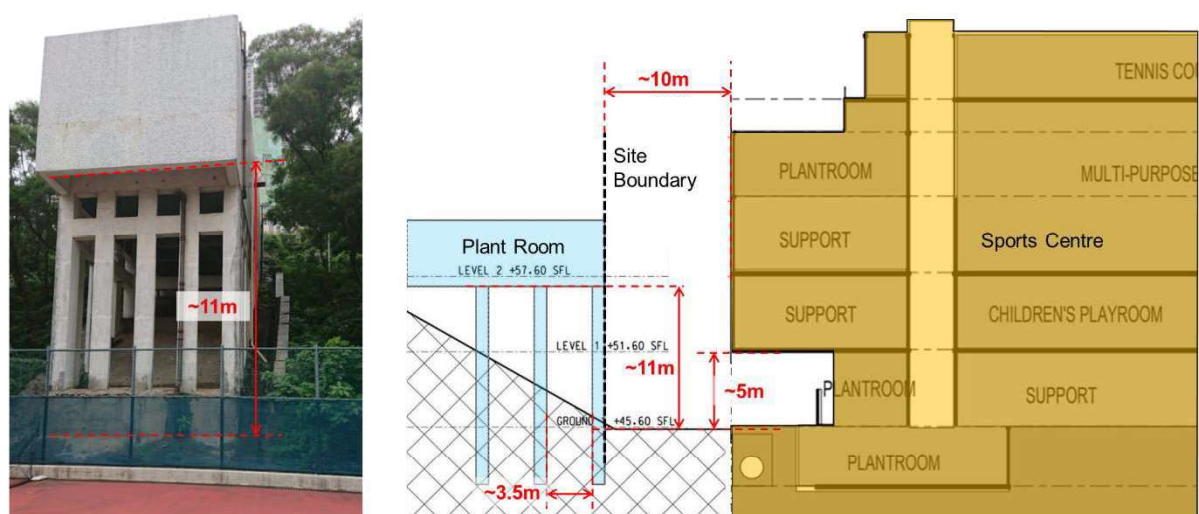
Schematic Section View of the Plant Room and Sports Centre
